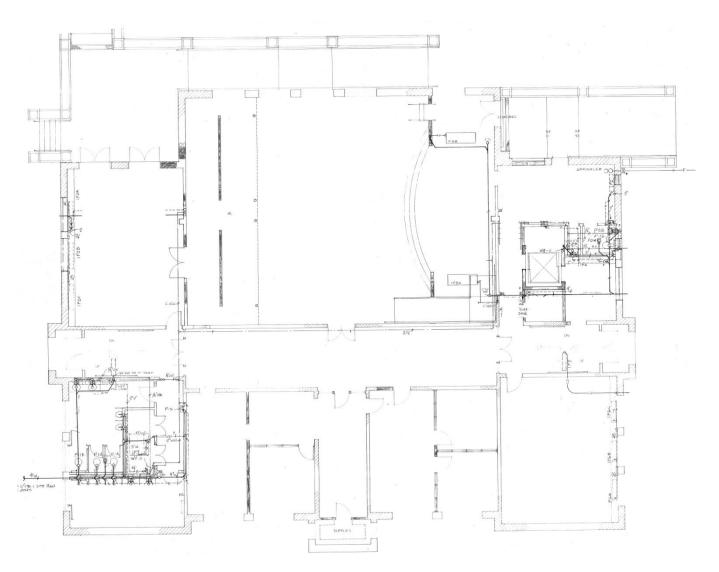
first floor plan, existing (Killis Almond & Assoc. 1993)
